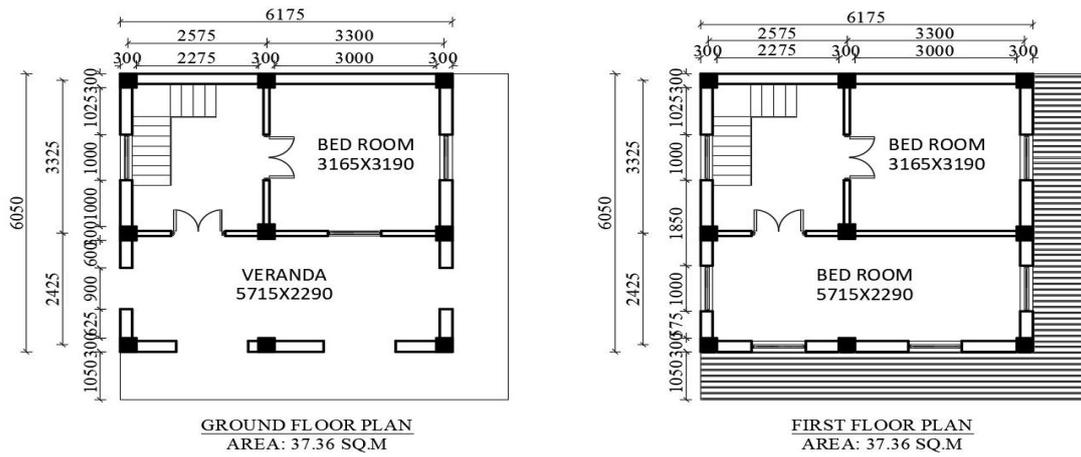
Ground floor and first floor plan BMC 2.2 RCC
